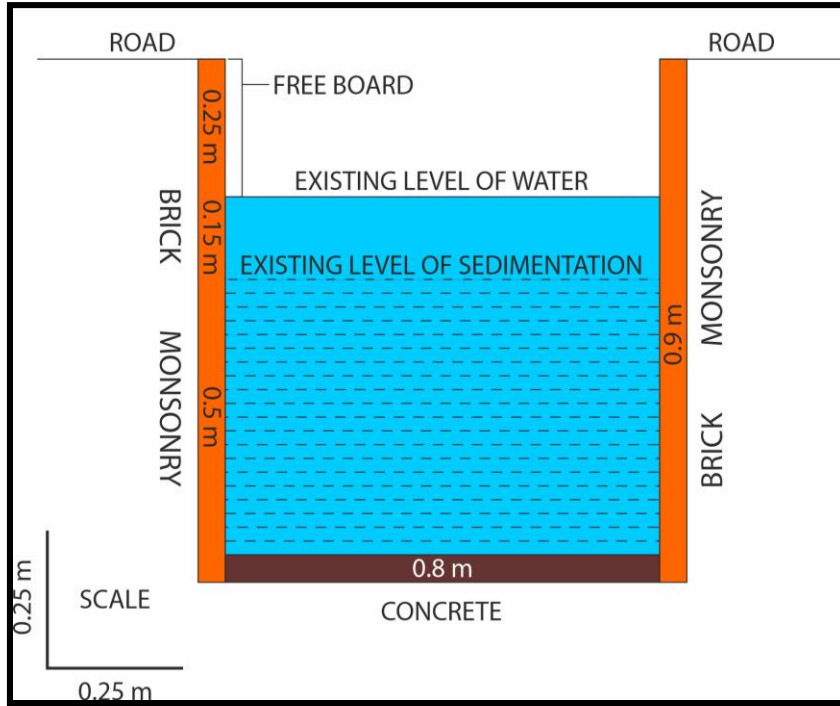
Cross Section of a Boro Pucca Drain (Large Concretized Drain)
